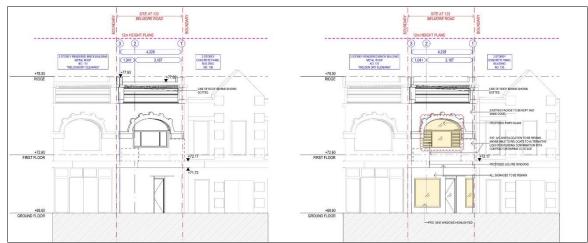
Existing (L) and proposed (R) Belmore Rd elevations (Square One Atelier)
